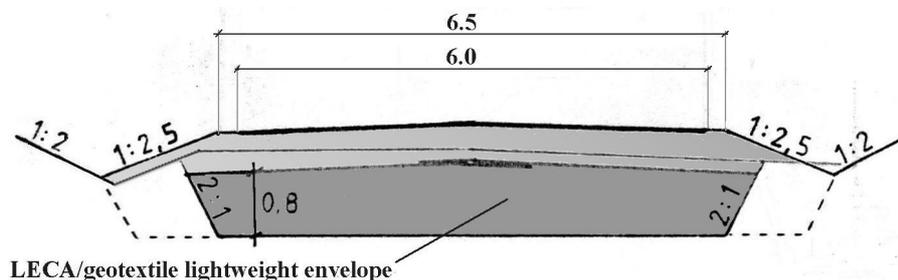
Cross-section through offloaded road. Source: A Valkeisemäki, Finnra, 2003
